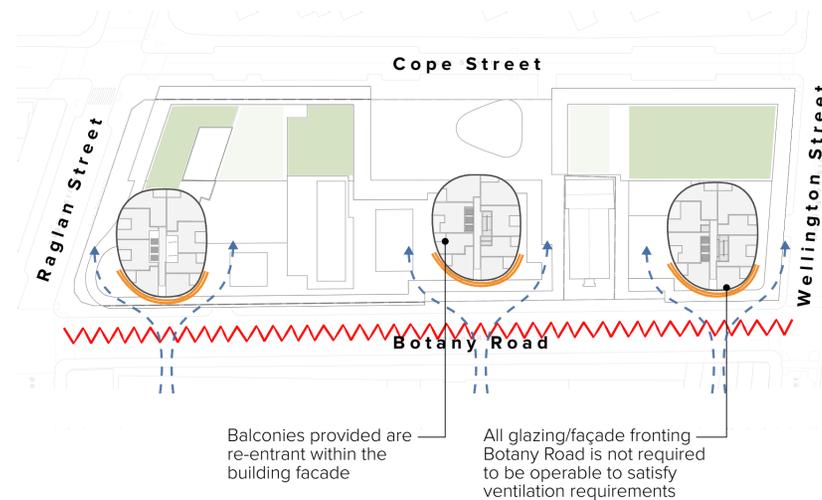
Wind and ventilation_Taller Buildings
